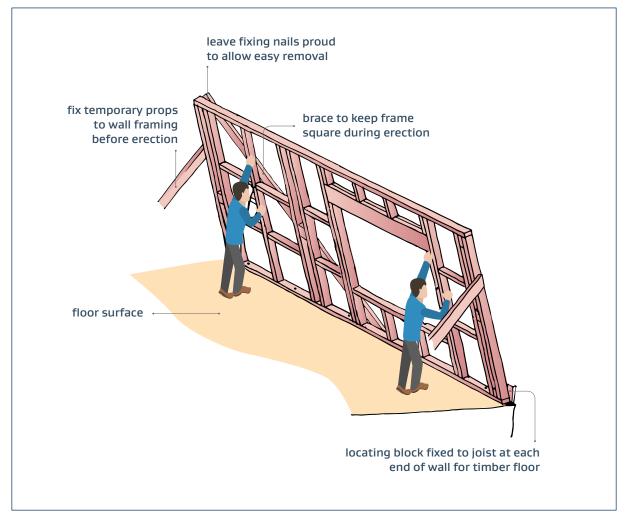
Fix temporary props to the wall framing before lifting the framing panel into position
